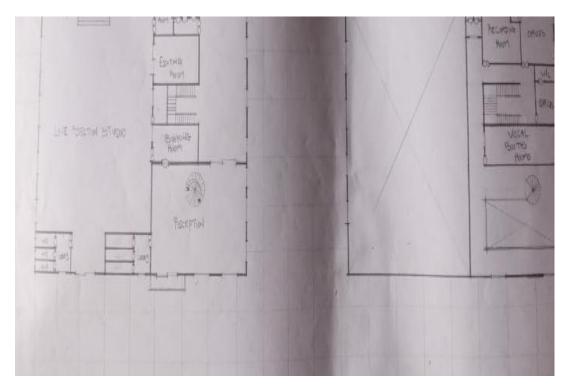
FLOOR PLANS OF CASE STUDY THREE
